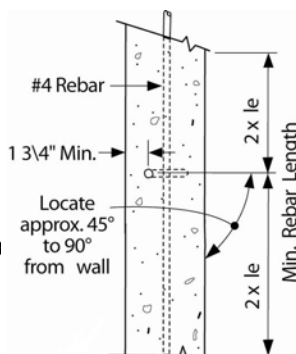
SSTB ANCHOR BOLT INSTALLATION—ALONG CONTINUOUS STEM WALL (No. 4 Rebar Min. Length = 4x l_e , Min. 1³/₄\"/>
